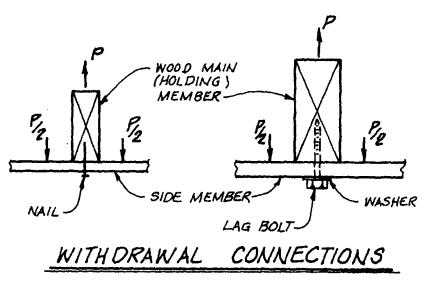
Nail and lag bolt connections subject to withdrawal loading.
